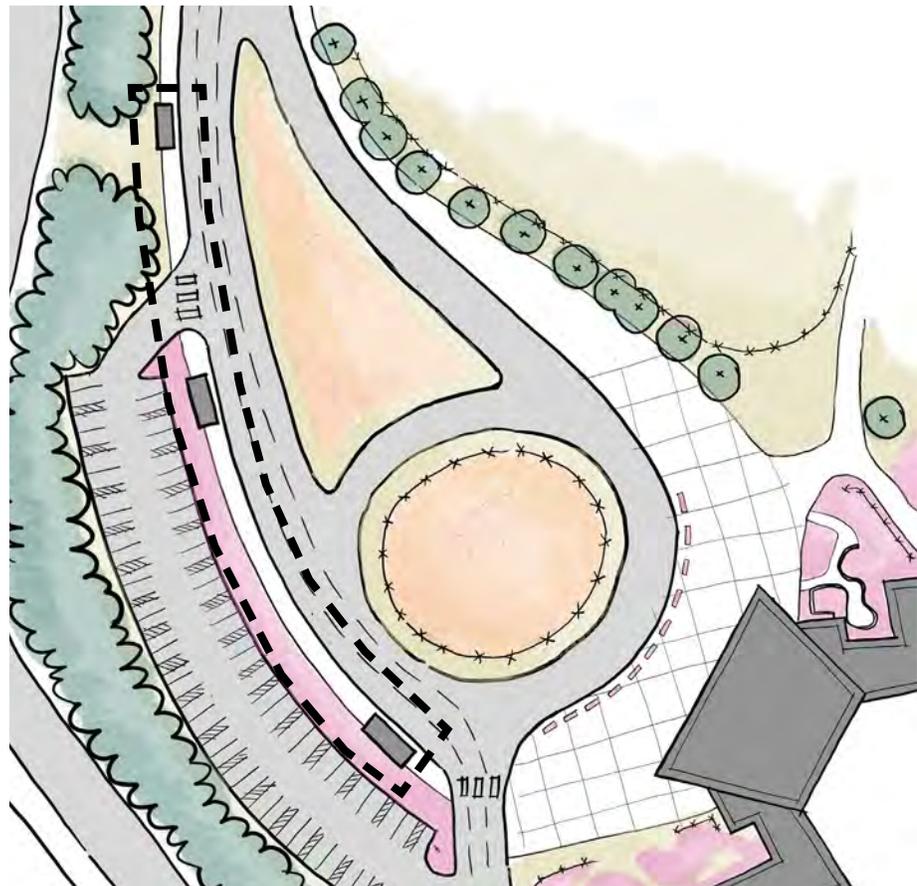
Proposed segmented walkway shelters along proposed walkway on south side of Main Circle Drive (QE, 2020).
